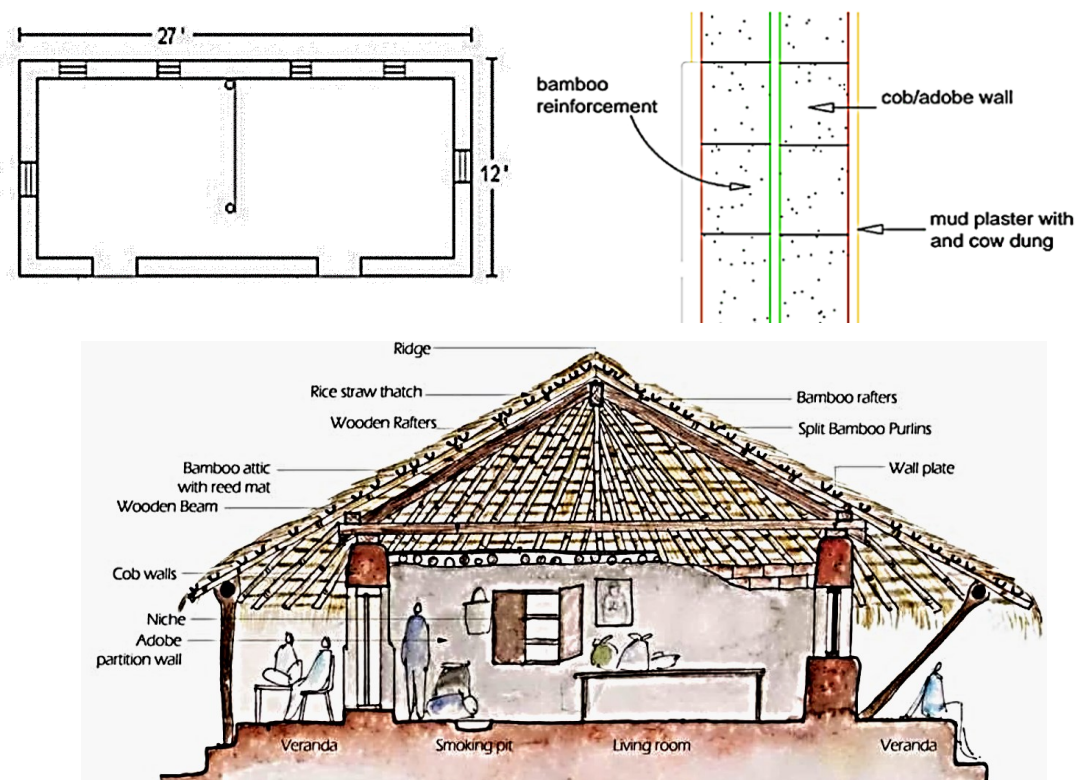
Plan, section, and detailed cross-section of a mud house
